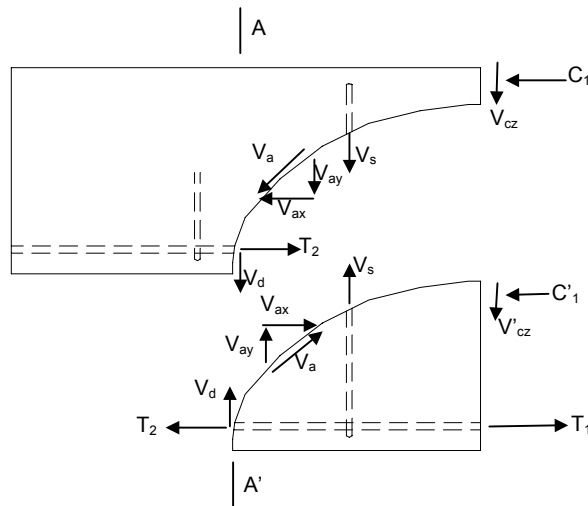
Internal forces in a cracked beam with stirrups (adapted from MacGregor et al. 2000).
